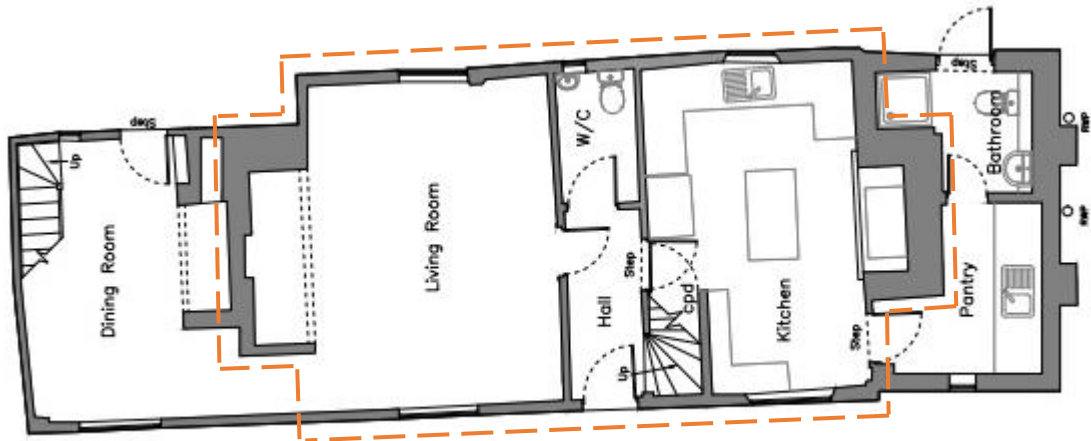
Ground floor plan highlighting extent of C16 range (Gateley Smithers Purslow)
